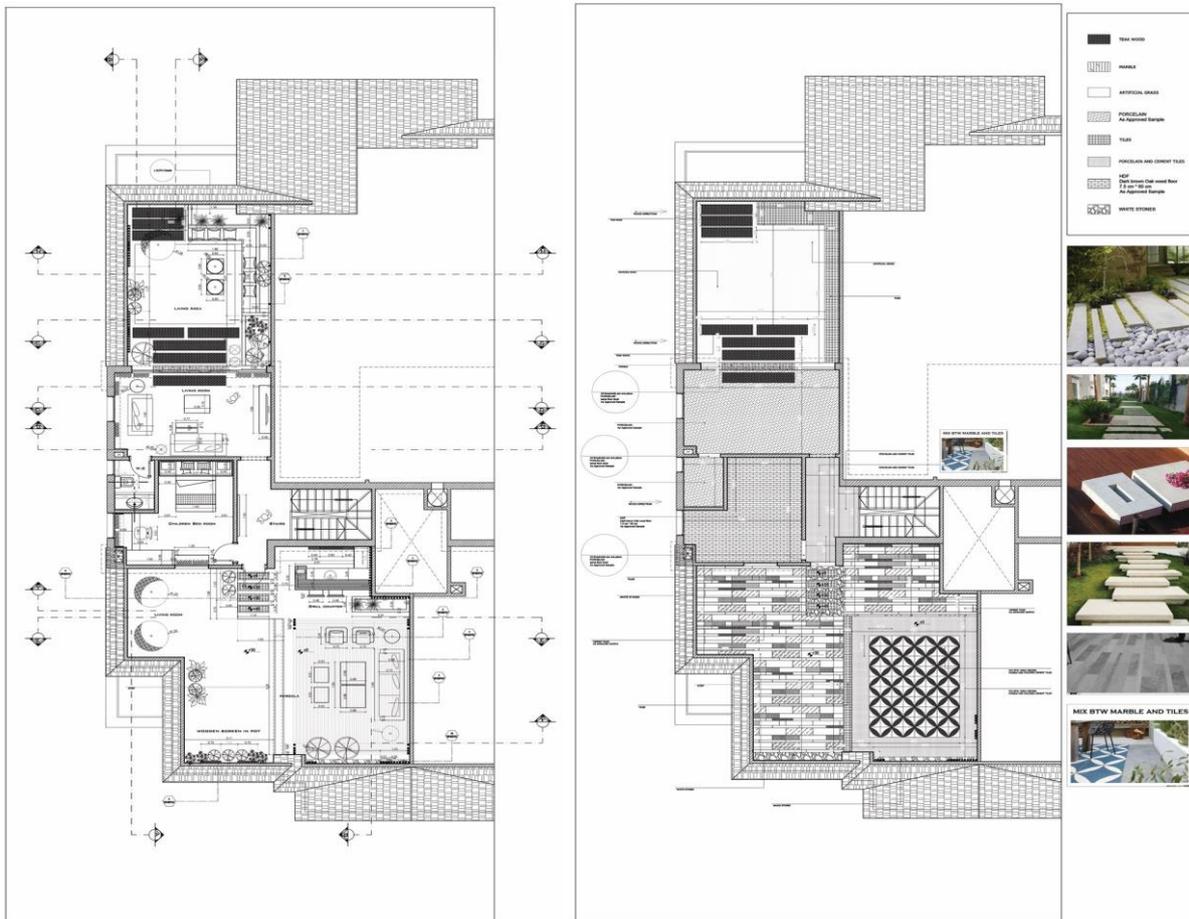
Furniture Ground and Flooring Plan, Roof Floor of Twin House project. (source: Auther,2021).
